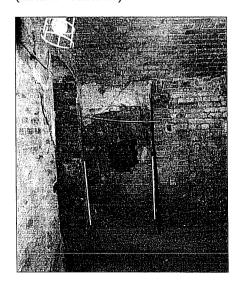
South wall of B37 showing blocked door, the ceiling obscures an earlier opening (Archive - Photo 22)
